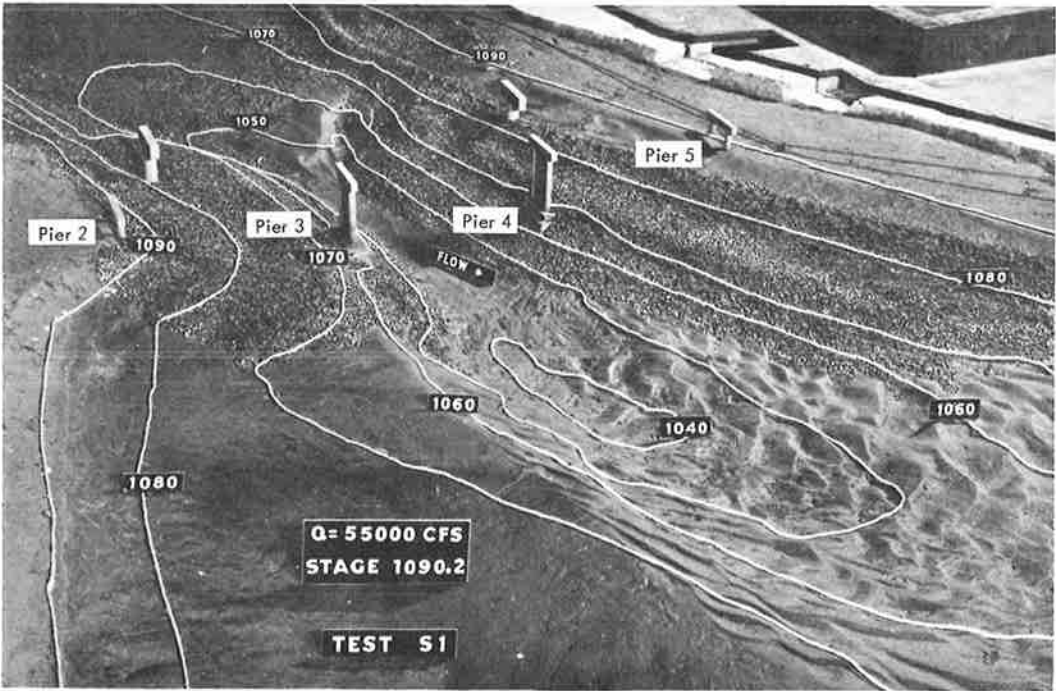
Erosion pattern resulting from flow through reconstructed bridges and protective works.
